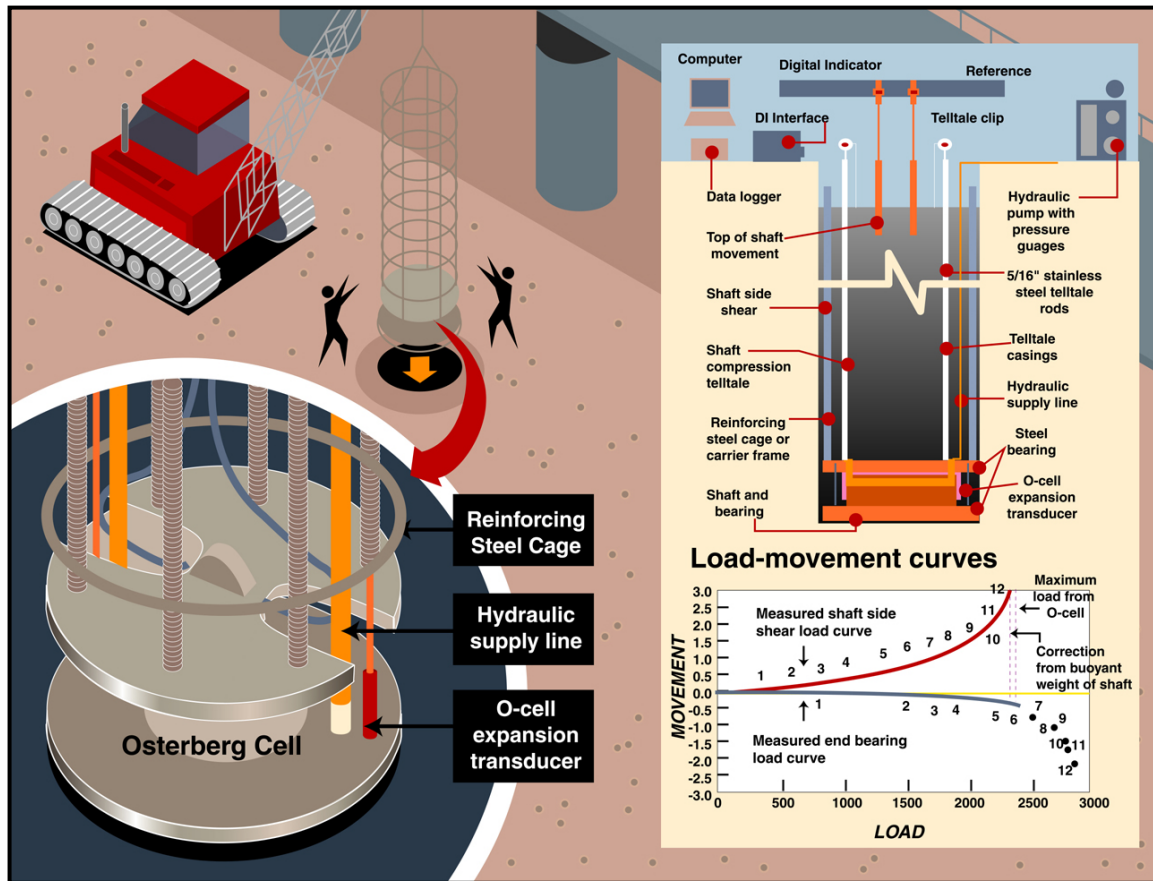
Some details of the O-Cell[®] test (after www.bridgebuildermagazine.com).
